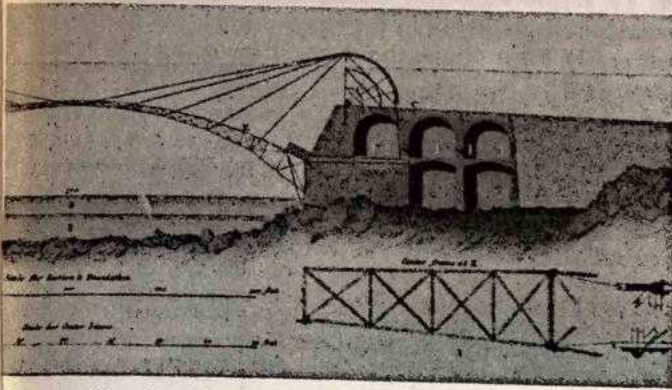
Menai Bridge cast iron arch proposal 1811 - Design for suspended centering. [15].
